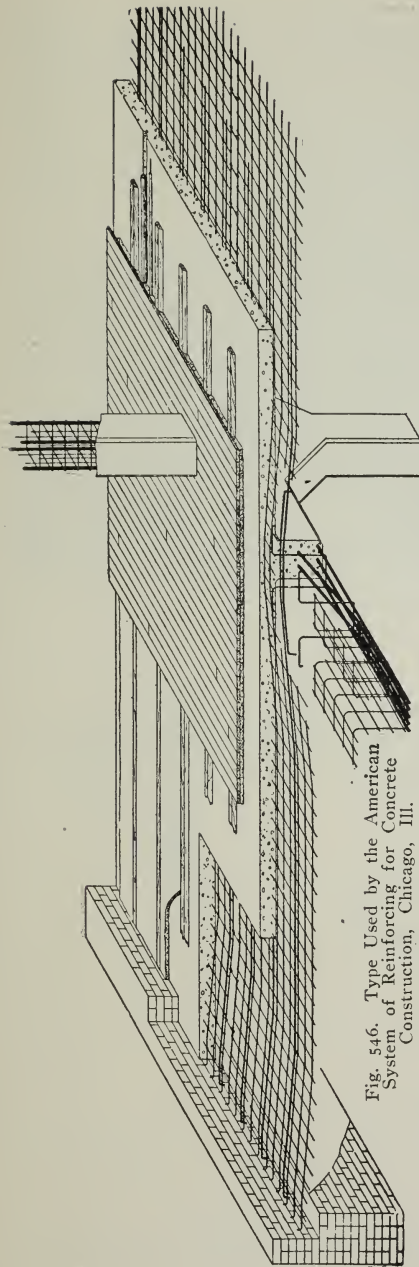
Type Used by the American System of Reinforcing for Concrete Construction, Chicago, Ill.
